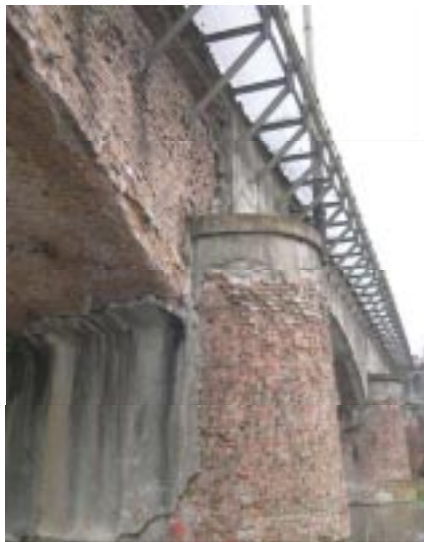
Showing reinforcement on top and shotcrete operation at bottom
